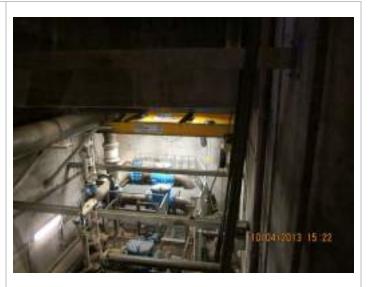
Monorail cranes SN 1250-3 and SN 1250-4 at the bottom of the Dry Well. The crane inspection certificates may have expired.
